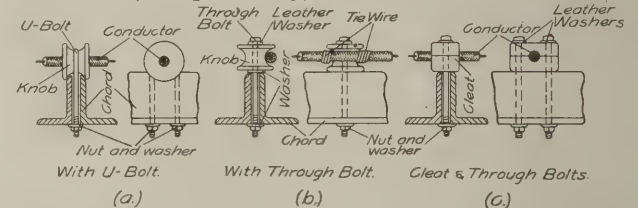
METHOD OF ATTACHING KNOBS TO TRUSS CHORDS. A commercial wire rack with a cast iron base that can be bolted to any surface, is shown in Fig. 8. Generally a steel frame rack is preferable to a wooden one. The rack of steel angles of Fig. 6 was designed for installation in the top of a pipe tunnel. The insulators are held to the cross angles with bolts, with a leather washer under the head of each. The steel rack of Fig. 7 is arranged for supporting from a ceiling. Angle crossarms can be used, as in Fig. 7b, or the cross arms can each be formed of two iron straps, as in 7a. With the two-strap method, drilling for the cleat bolts is unnecessary, and the cleats can be shifted along the arm into any desired position, and there clamped fast. Strain insulators engaging in turnbuckles
